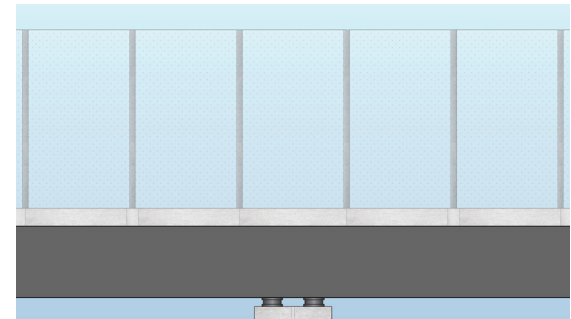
Typical locations for transparent noise barriers include bridges and elevated guideways
